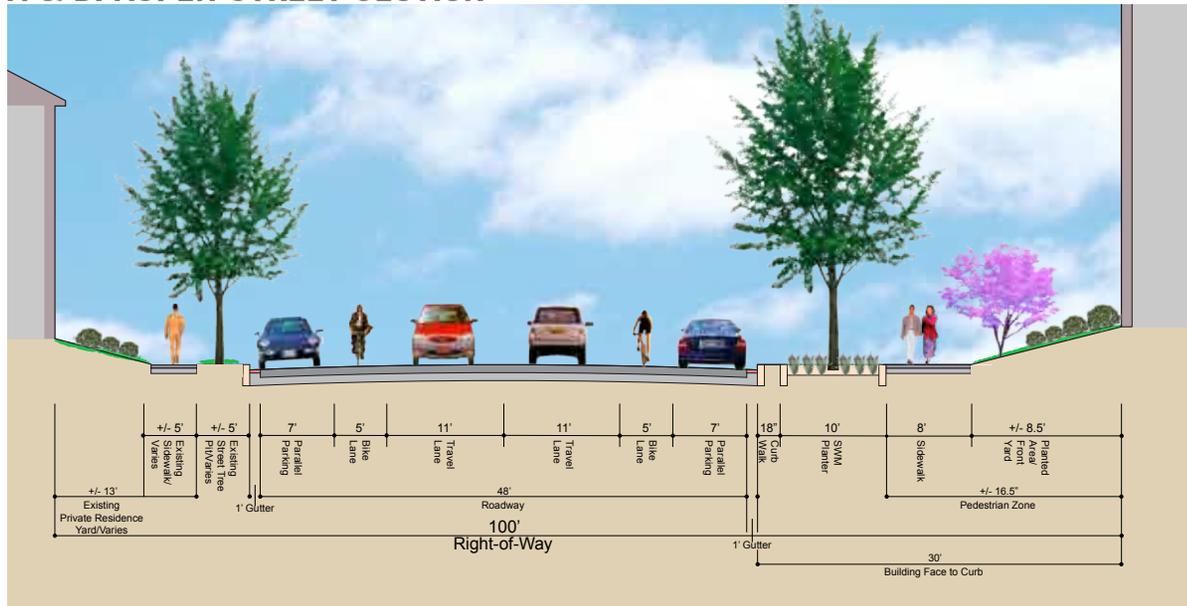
Aspen Street Section. Source: Perkins+Will.
